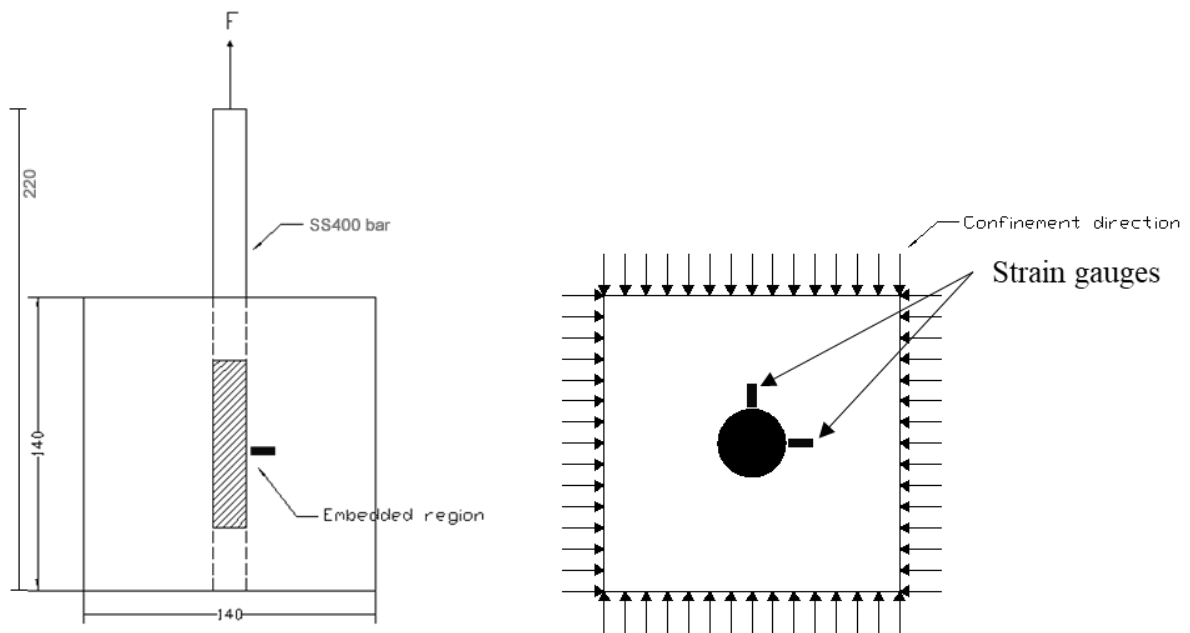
Detailed specimen setup and geometrical characteristics: (left) cross-section view; (right) top view
